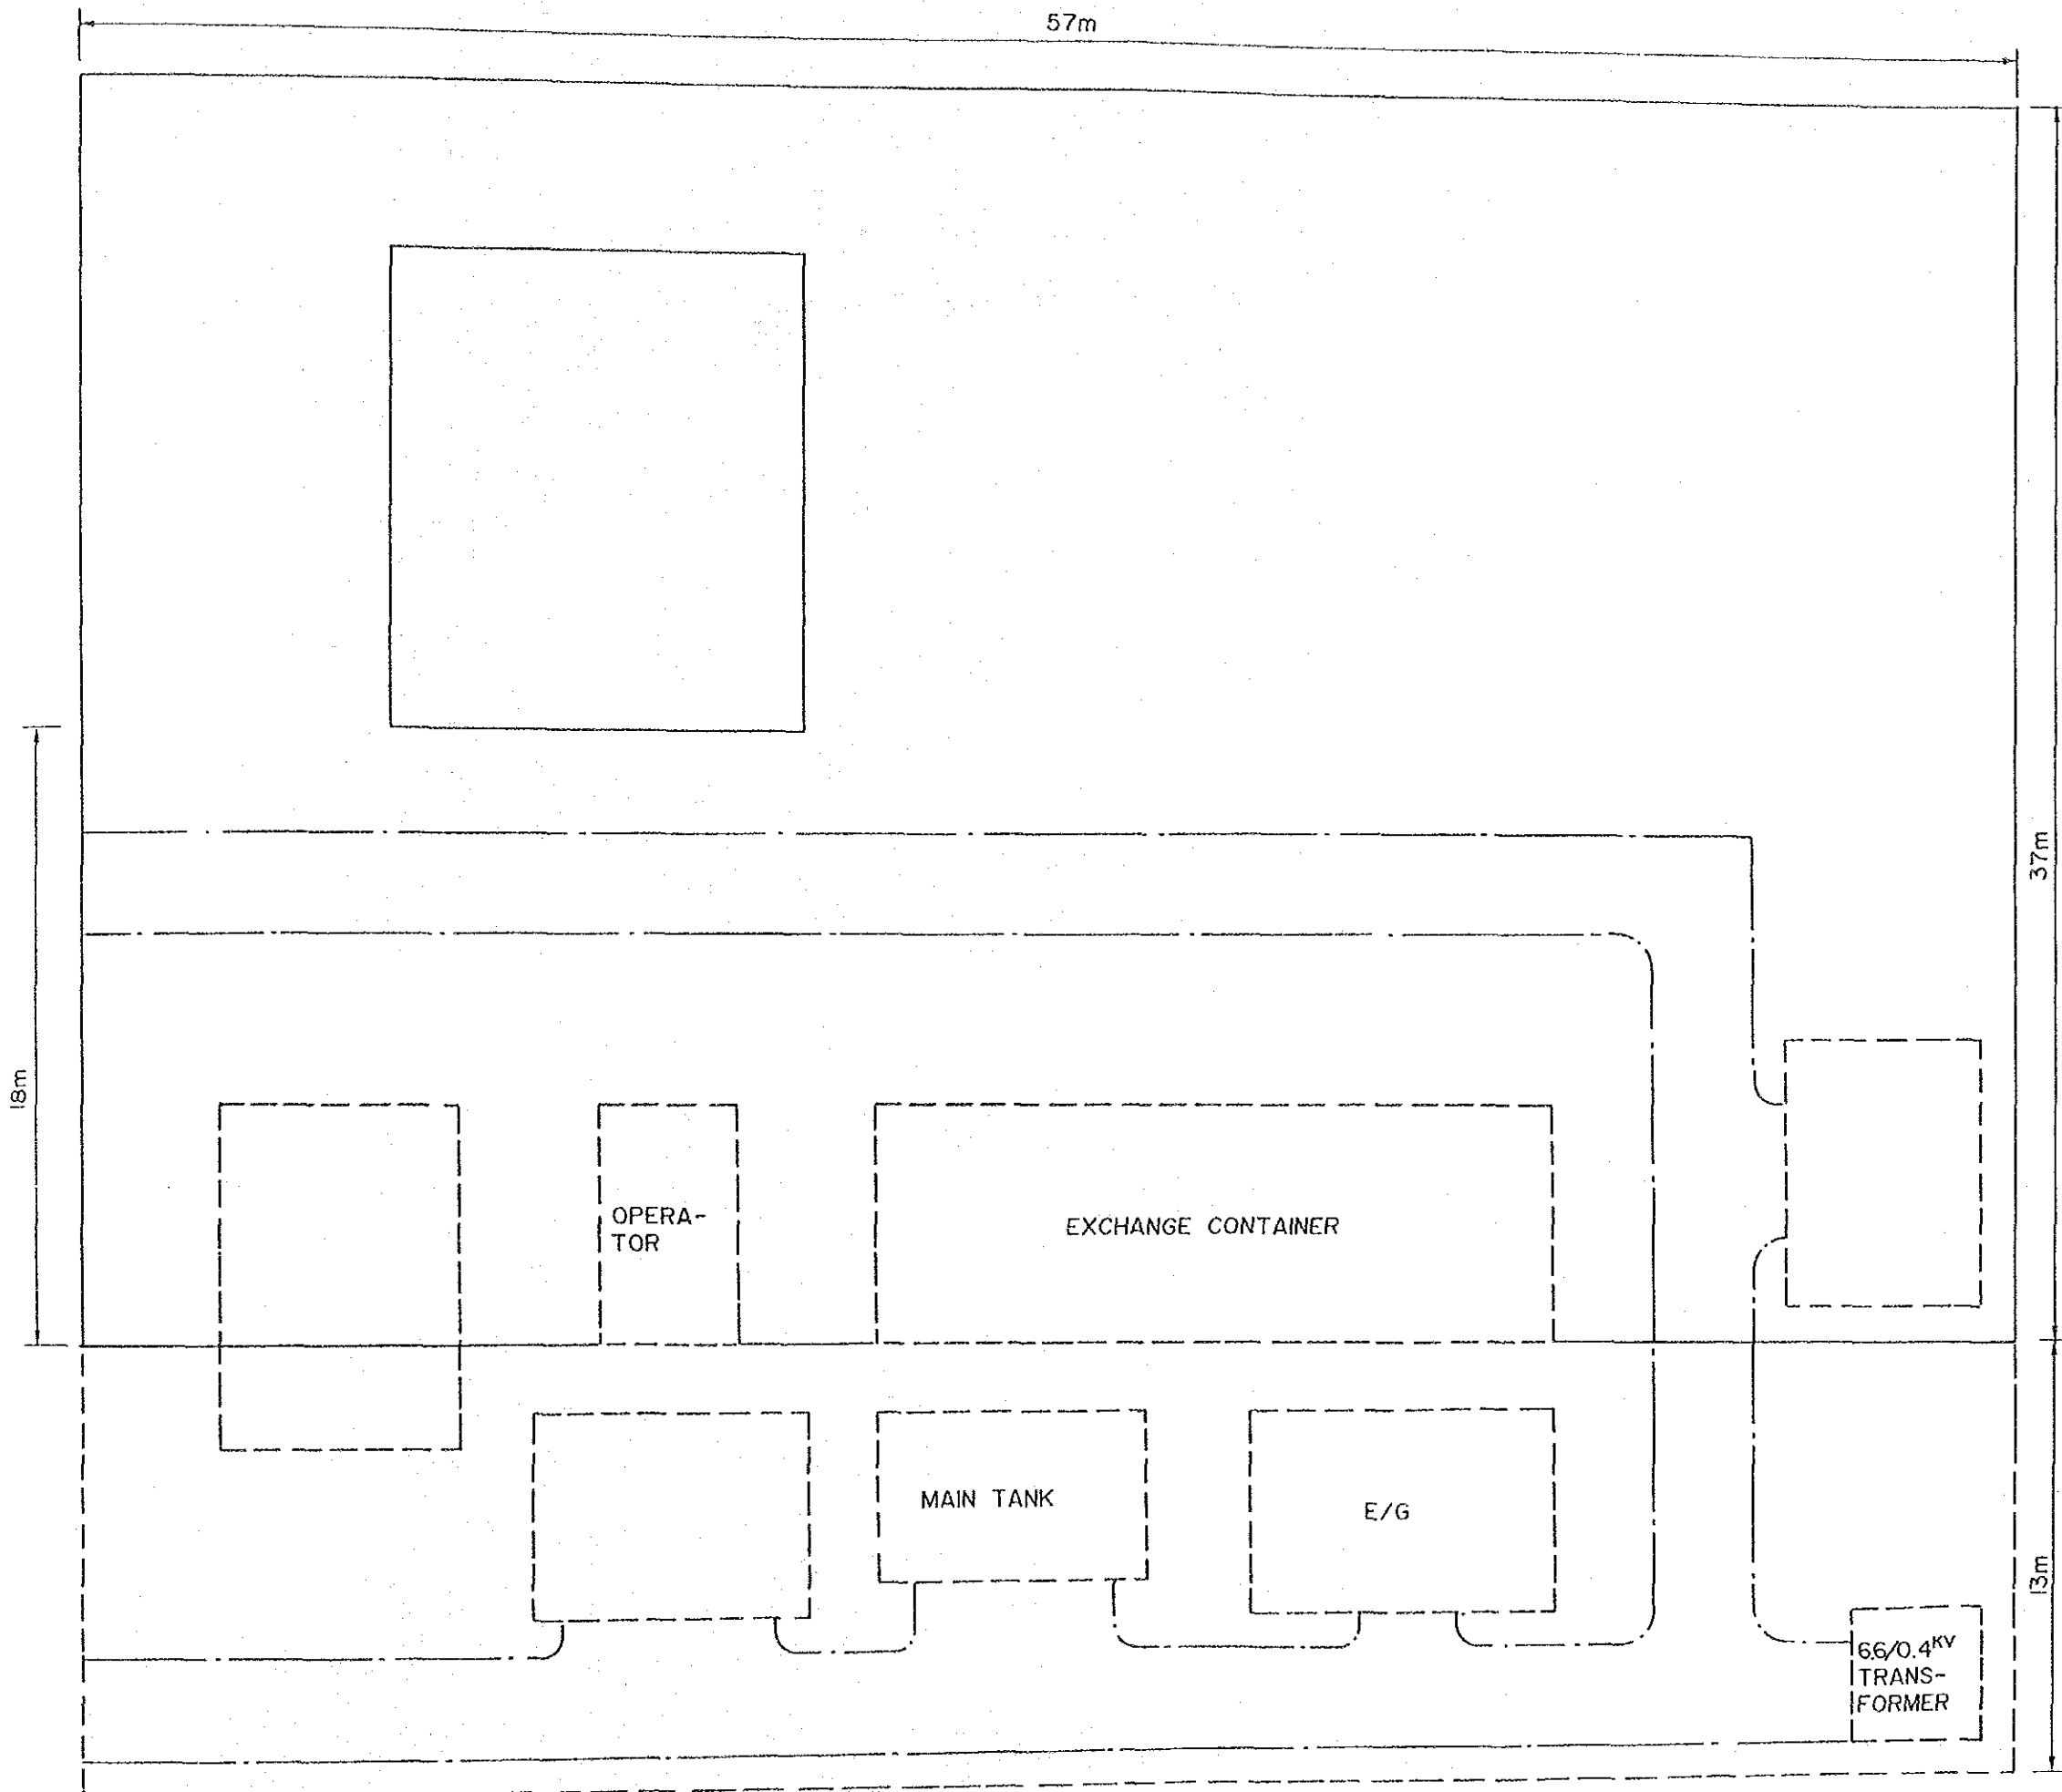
Site Layout Plan at Thaton New Exchange Office
